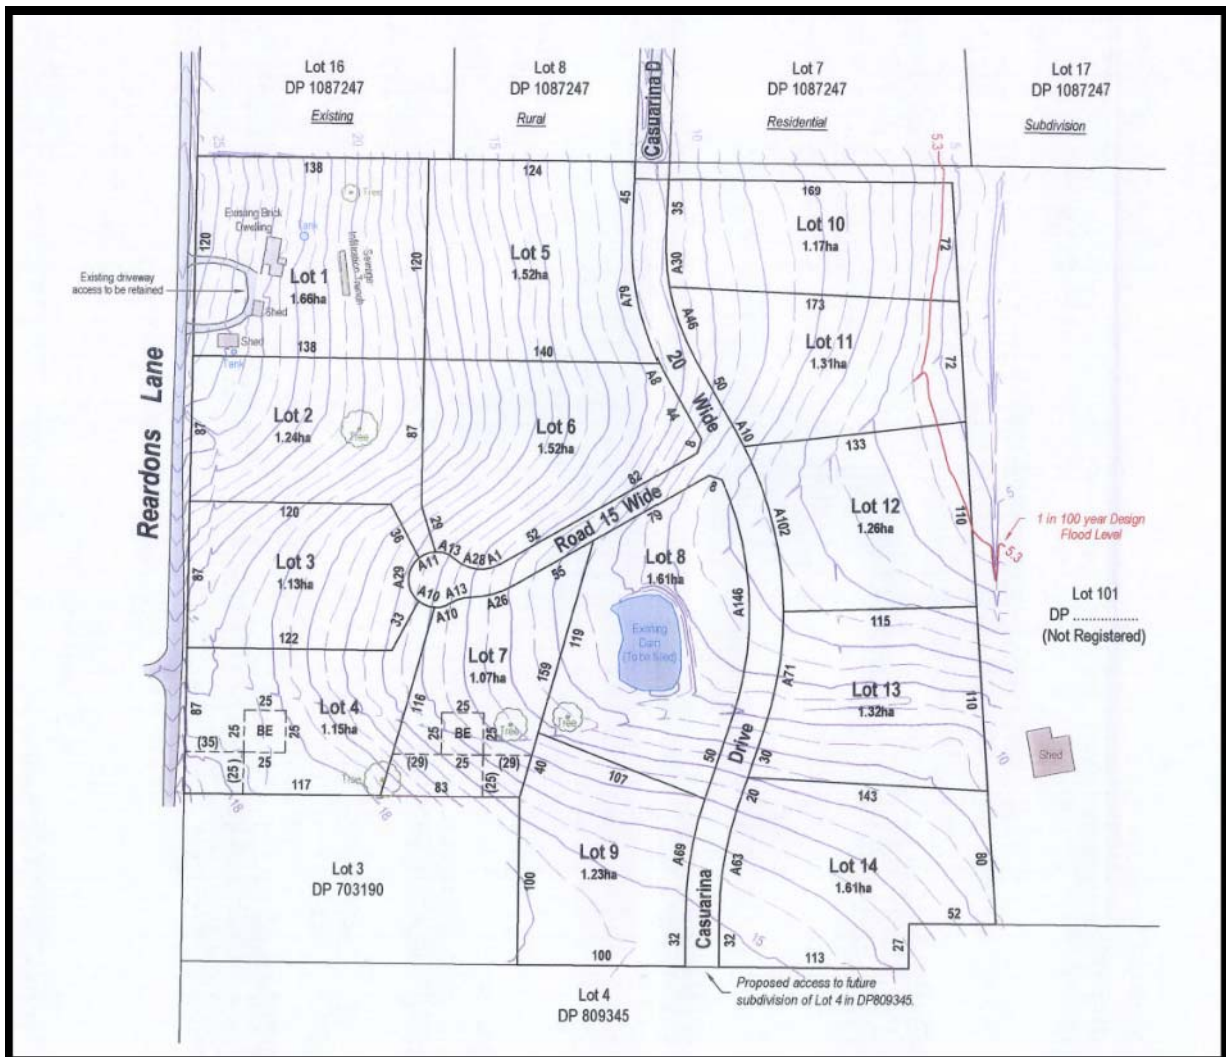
Concept Plan for the proposed subdivision of Lot 100 DP 1181445 into rural residential lots of a minimum one (1) Hectare. .
